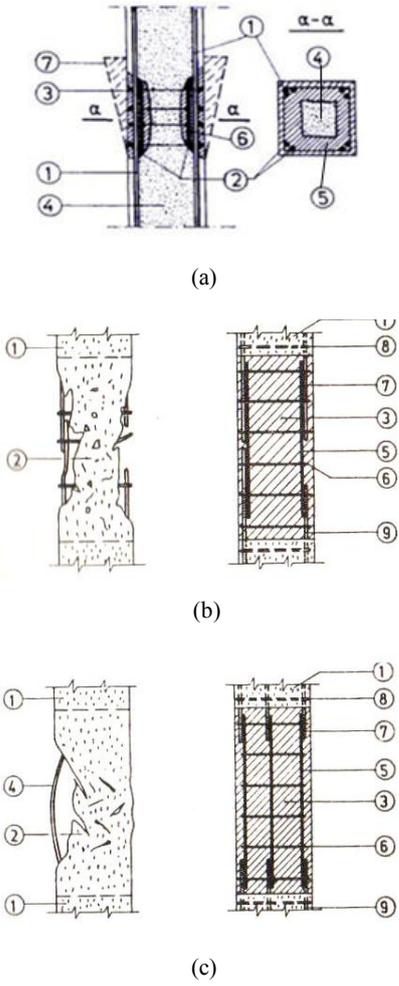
Repairing a damaged column [3] (a) Crushing of concrete; (b) Buckling of armatures (c) Open frames
